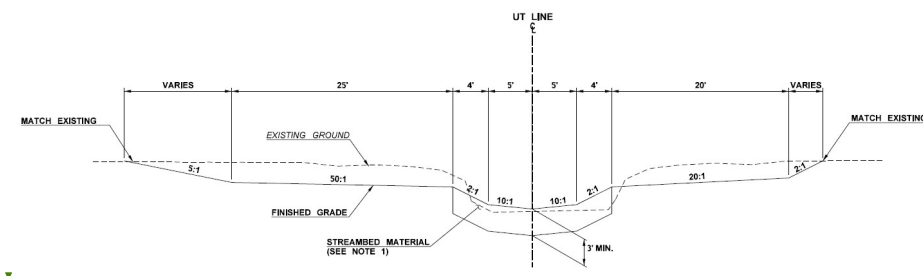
Reference channel-based design cross section for outside the culvert footprint.
